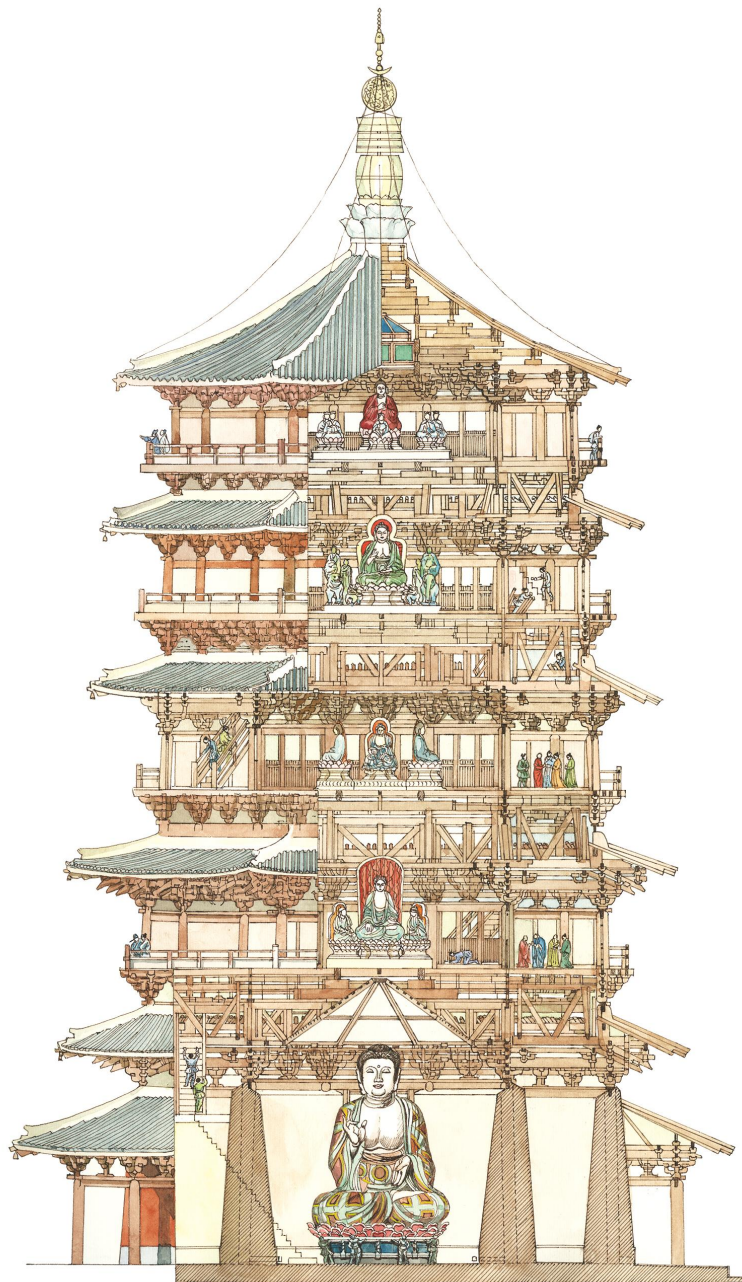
Elevation and Section Views of the Wooden Pagoda of Ying County
